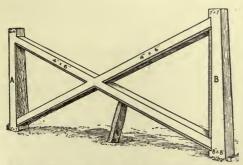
Cement corner post, B, and brace post, \mathbf{A} , with diagonal cement cross braces constructed in place. Forms should remain in place for at least a week.
